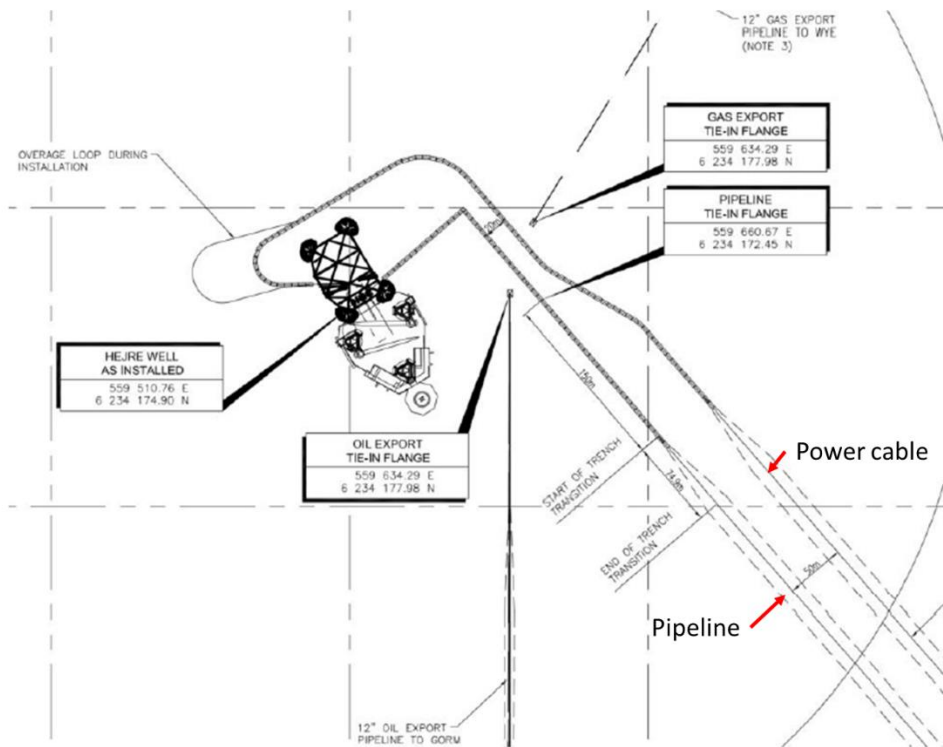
Pipeline and power cable approach to Hejre, showing the end of each trench. The untrenched part will be protected by rock dump
